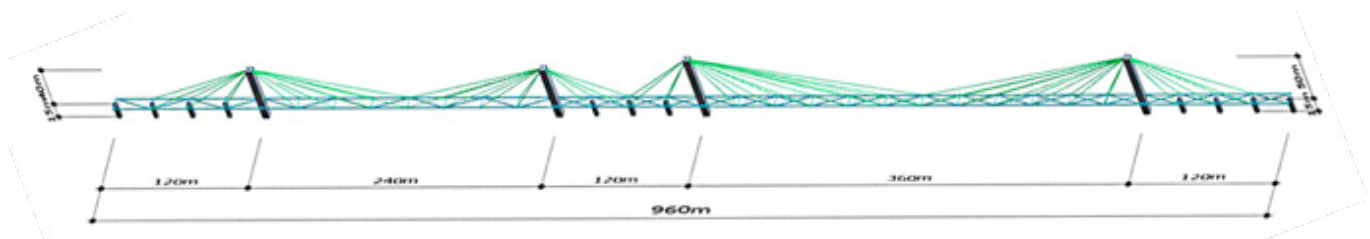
Fyris river bridge, a calculated span for GTS and Bike&Walk (AyCrete Design)
